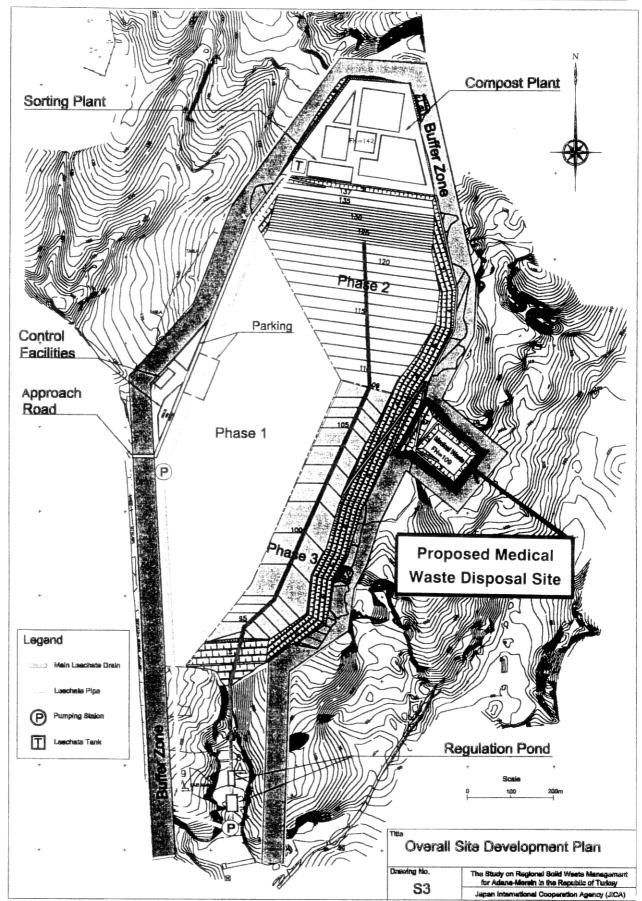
Proposed Medical Waste Disposal Site in Sofulu
